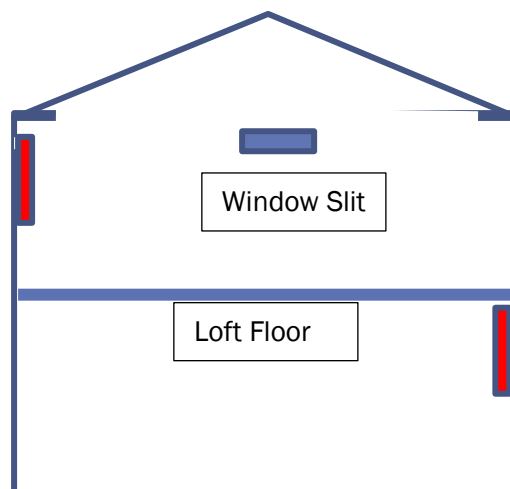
Basic layout of the proposed Bat House (bats will be free to fly between the two floors through trap door).
